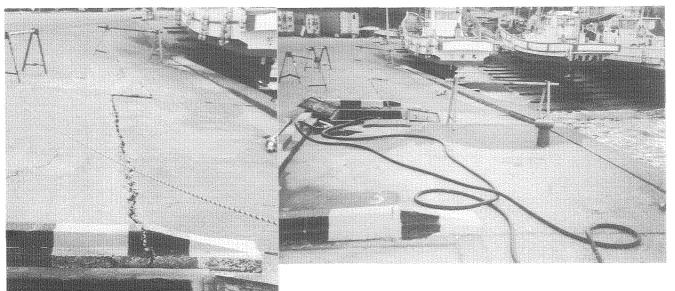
Tilt of a quaywall and subsidence of backfill at Taito fishing port
